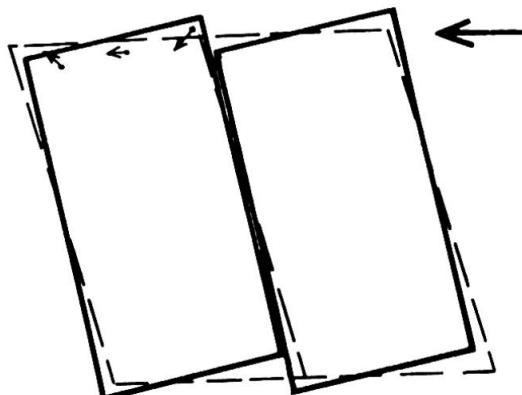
Wall element with two board panels loaded in shear. Schematic illustration of deformations. The small arrows show the deformation of the nails from board to timber frame.
